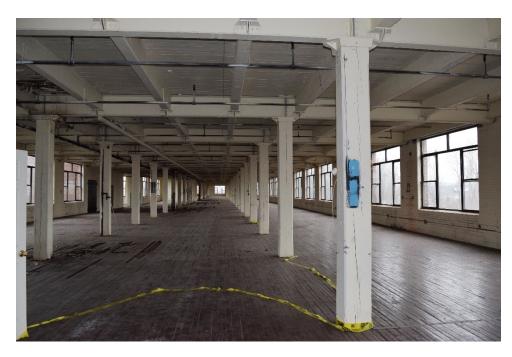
Landers, Frary & Clark, Building No. 835 interior, third floor, looking south toward Building No. 836.
